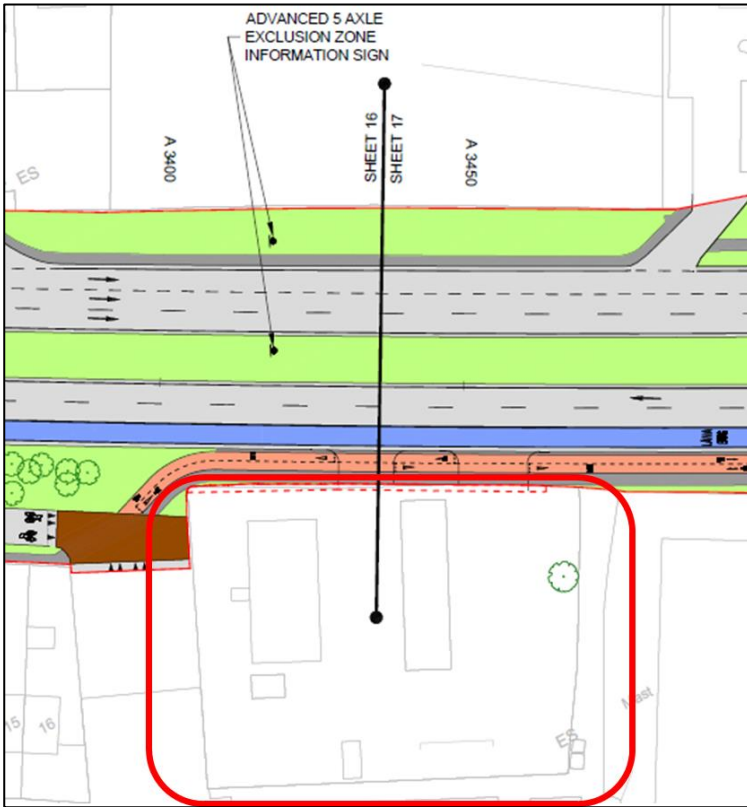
Proposed new Layout at the Circle K Service Station, Navan Road
